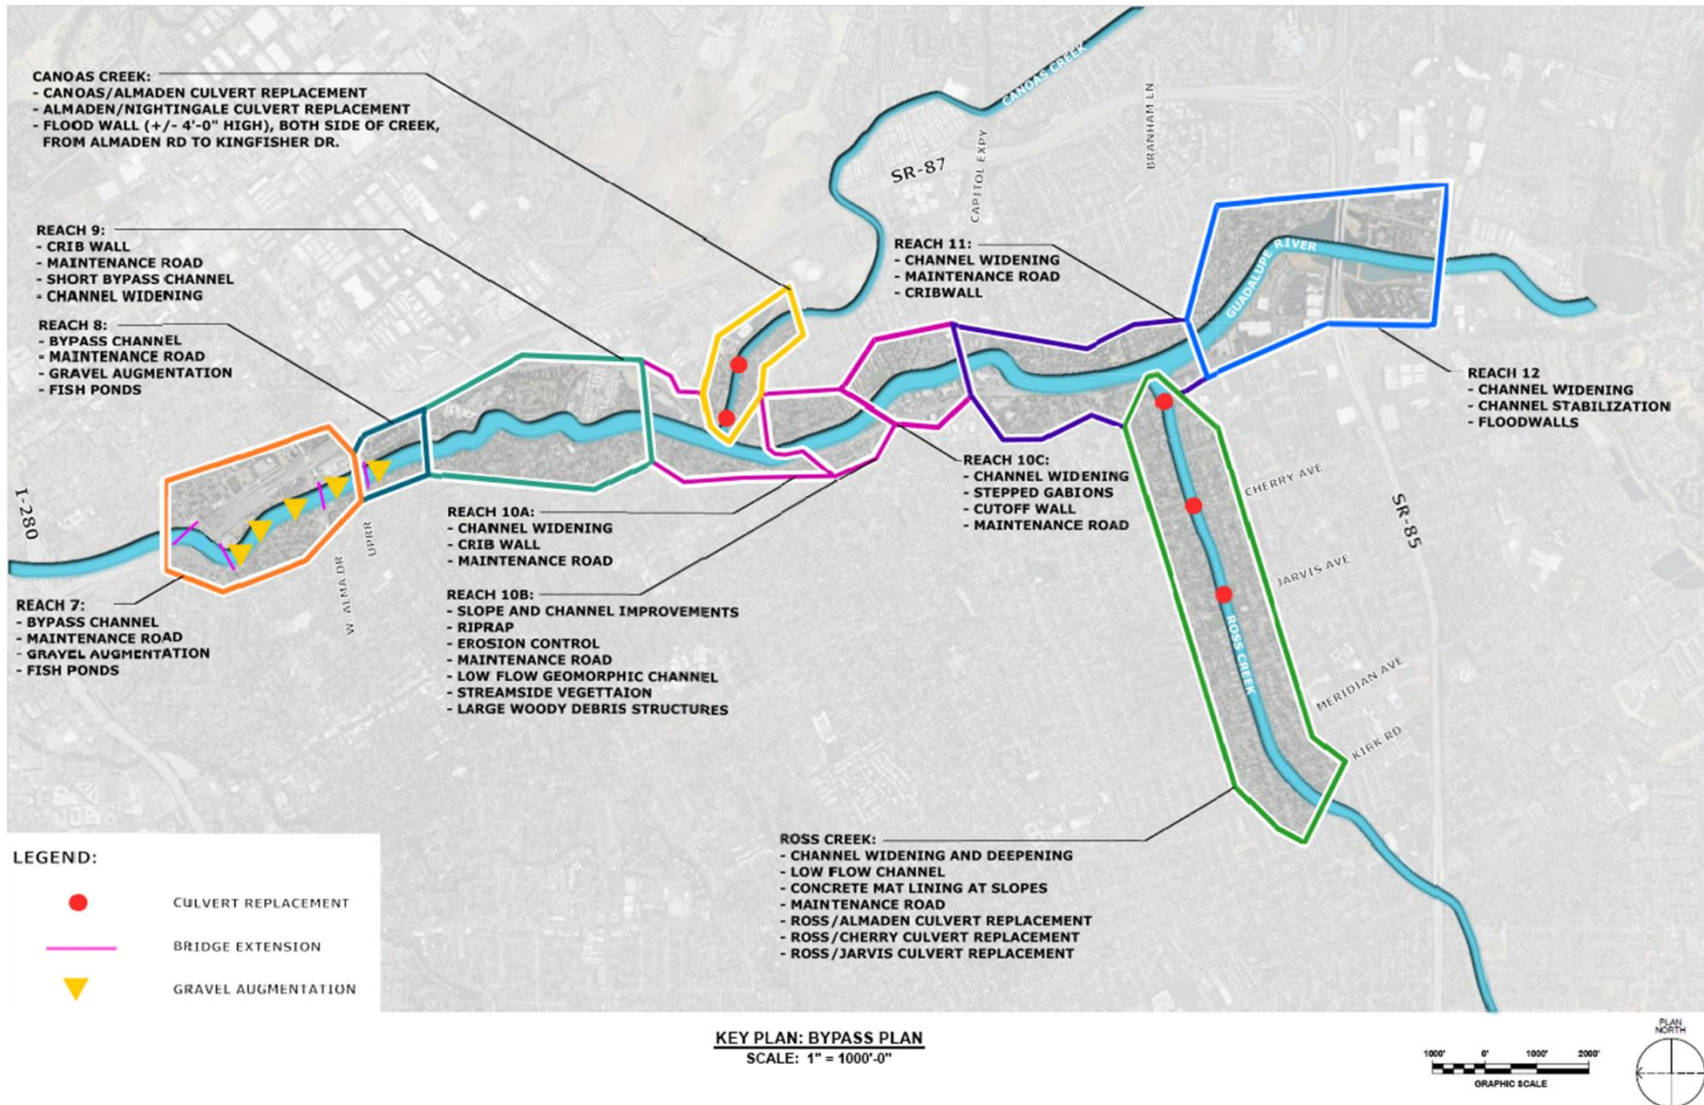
Summary of the key components of the Modified Bypass Plan (Alt 3b).
